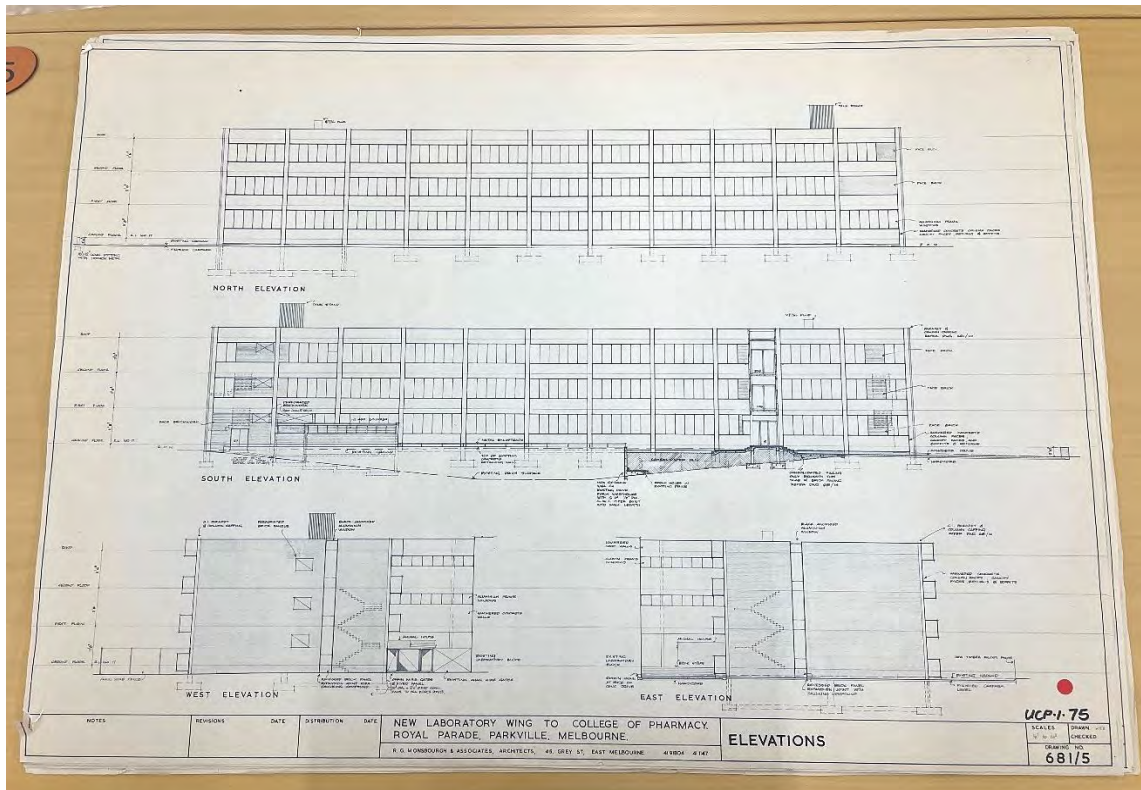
Drawing elevations of the proposed new building at 393 Royal Parade, Parkville (later named the Manning Building), by R G Monsborough & Associates, 1968. (Source: PROV 3686/P0014)
